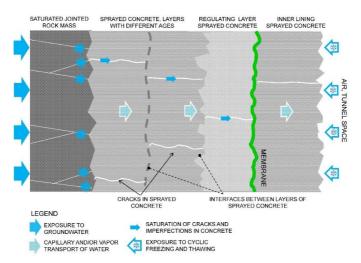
Conceptual drawing showing a model of the SCL structure with constituent materials and water exposure
